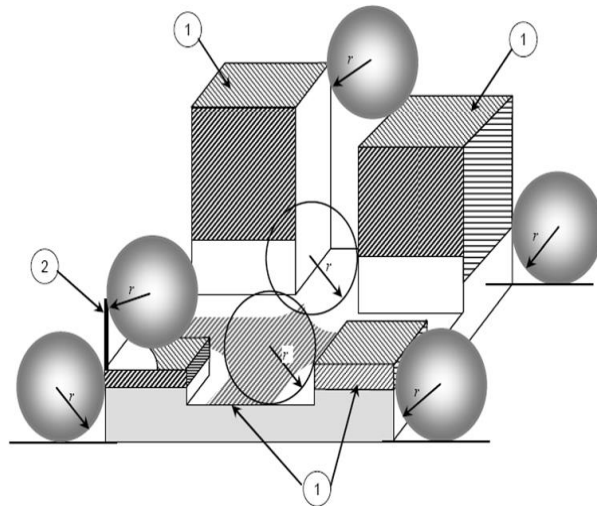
The application of the rolling sphere method to a building. Shaded areas (marked 1) are exposed to lightning strikes and need protection. Marked as 2 are the metallic masts installed for protection
